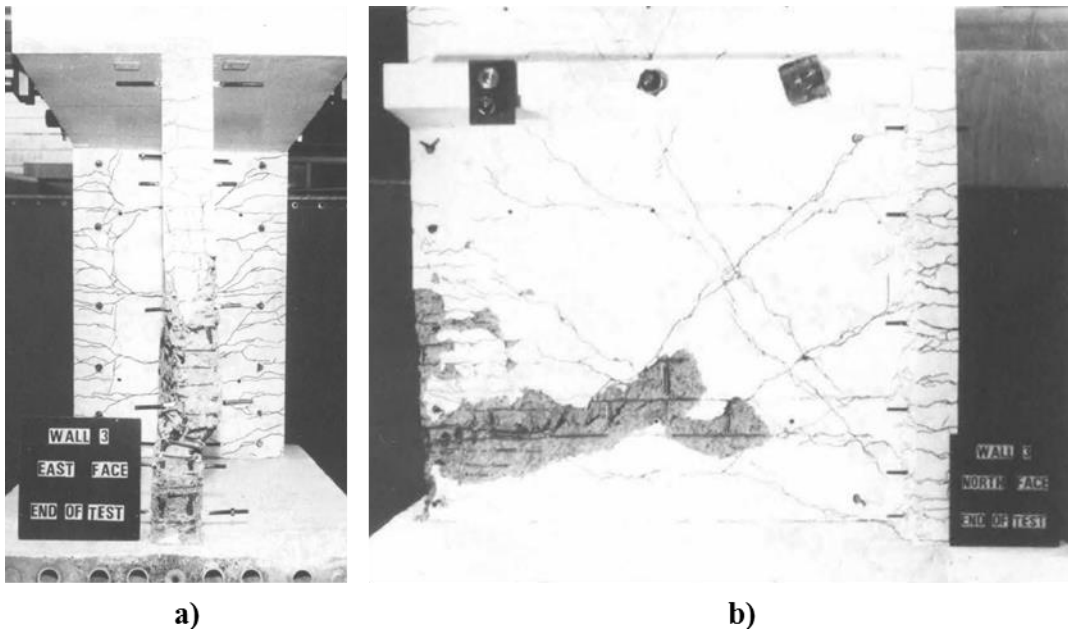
Wall 3 damage – a) Out-of-plane deformation at east boundary, and b) Web crushing
